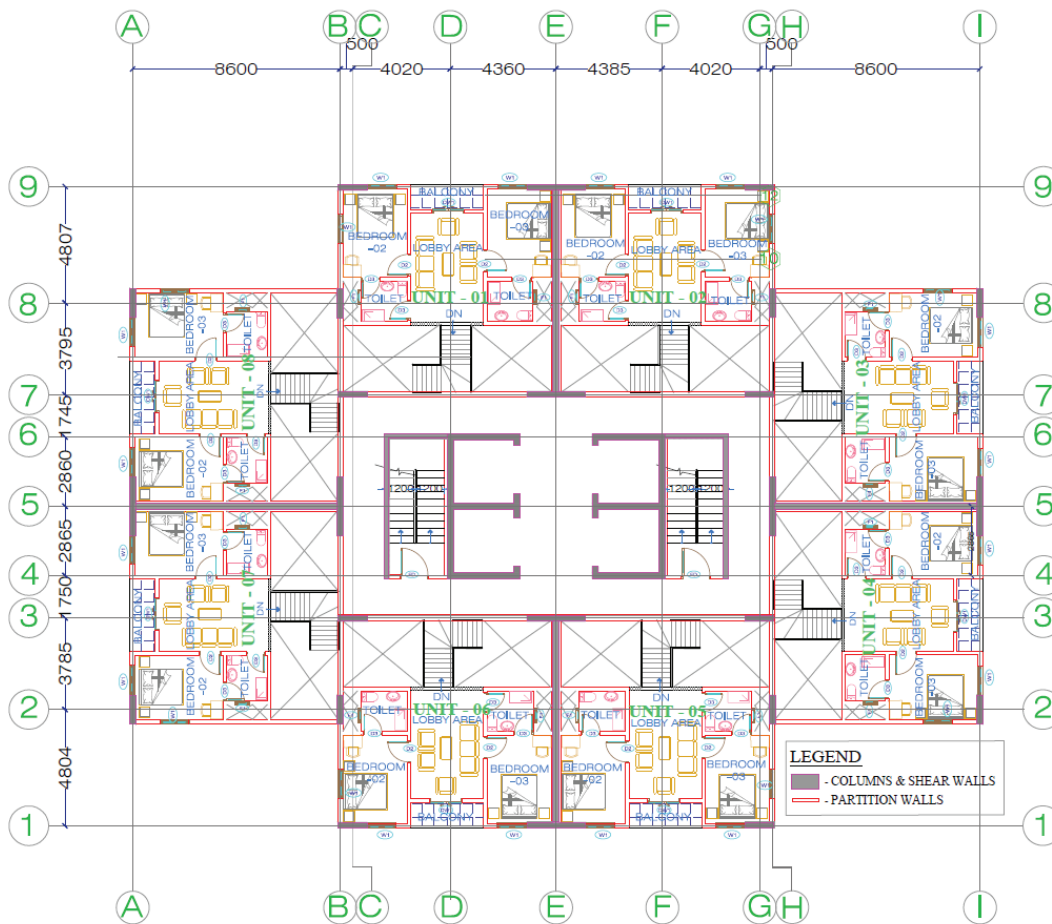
Proposed Mezzanine (Intermediate) Apartment Level Floor Plan
